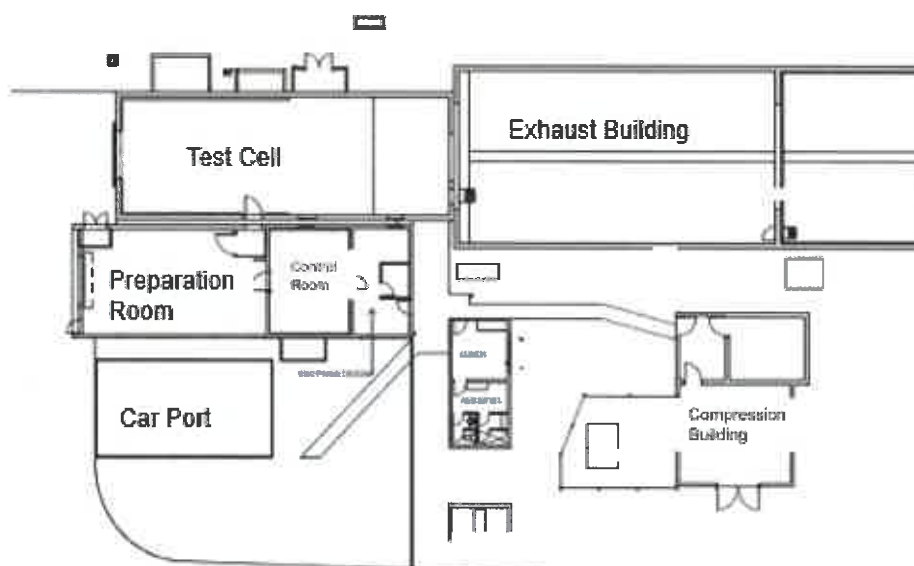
Proposed Floor Plan of Engine Test Cell 1
